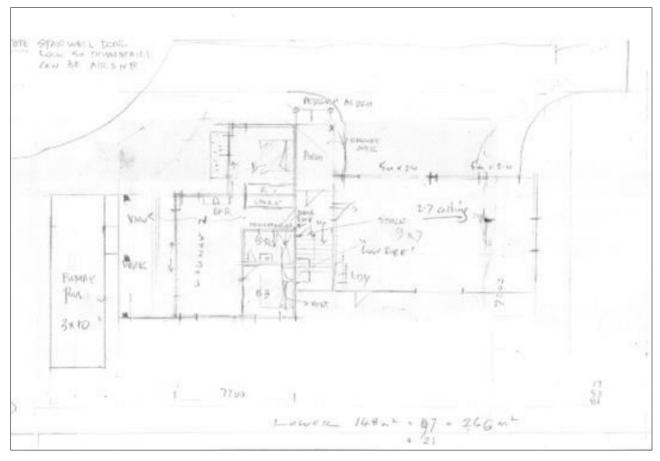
Excerpt of Supplied Site Plan Showing Proposed Dwelling Lower-Level Floor Plan(Source: Coastal Homes (2008) Limited).
